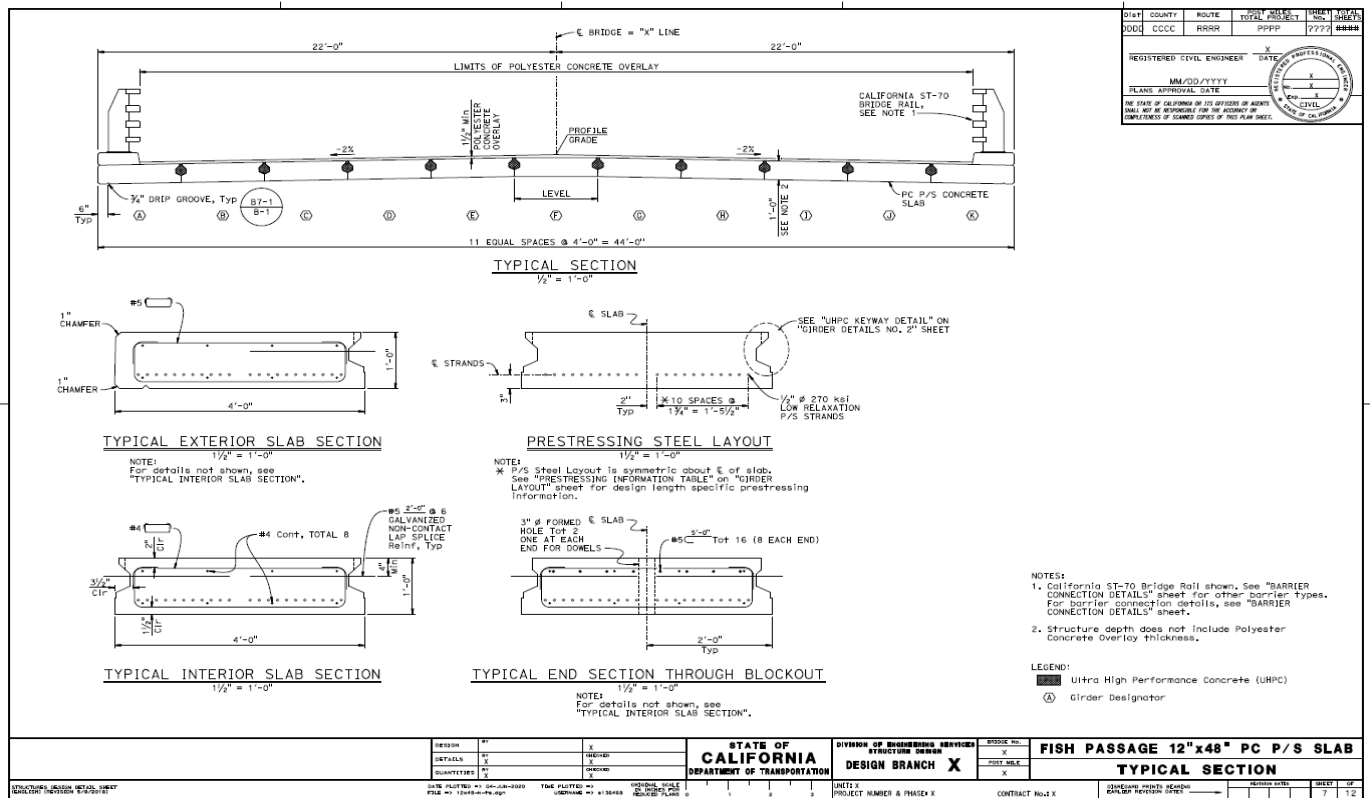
Example Plans for Caltrans Pre-Design Bridge Work
